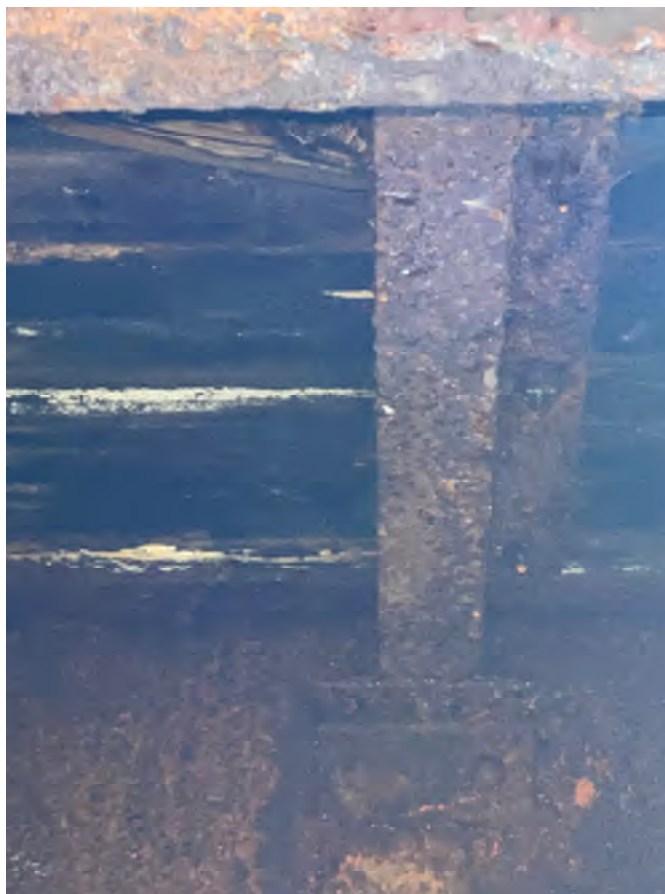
Gordy Jolma No 9 Railcar beam and cross beam severe corrosion and deep pitting
